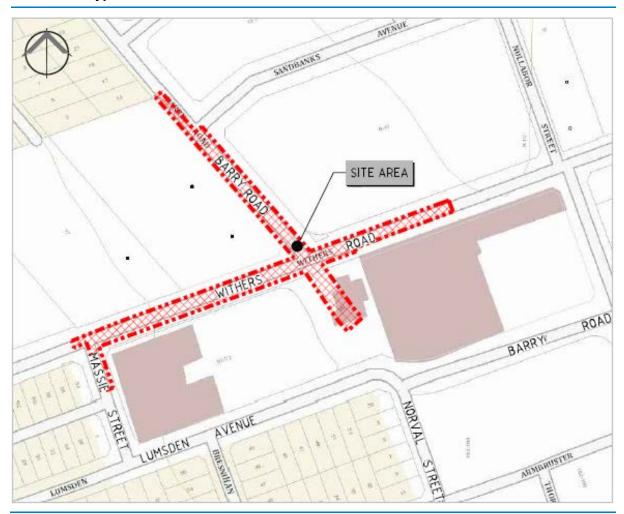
Site area for the Withers Road/Barry Road & Hezlett Road and Barry Road bypass roads
